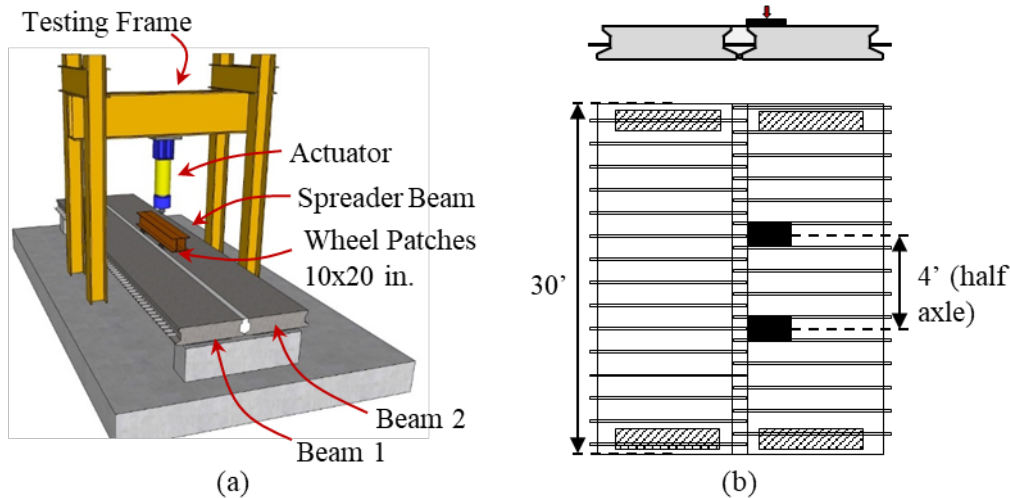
Proposed test setup for Configuration 2-1 (a) schematic and (b) plan and elevation views
